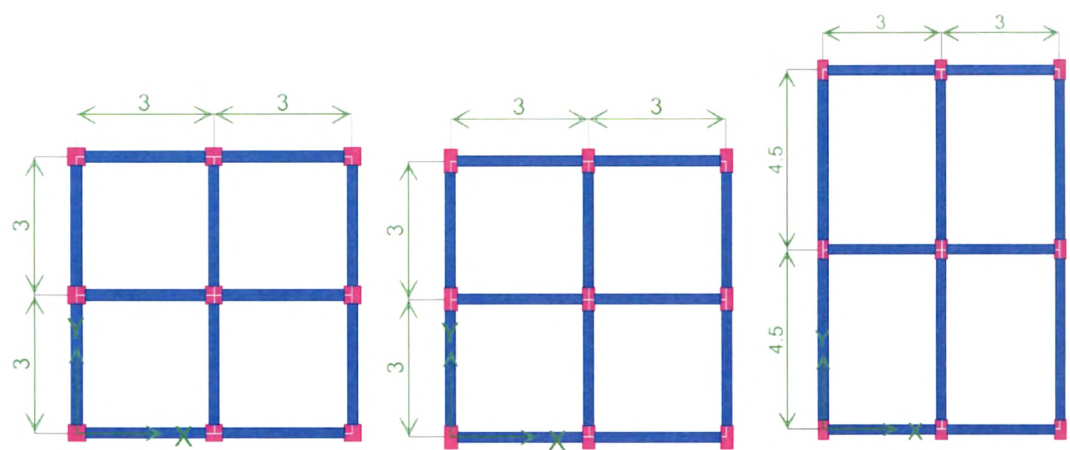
Typical Plan Views showing Column Orientations in Models
